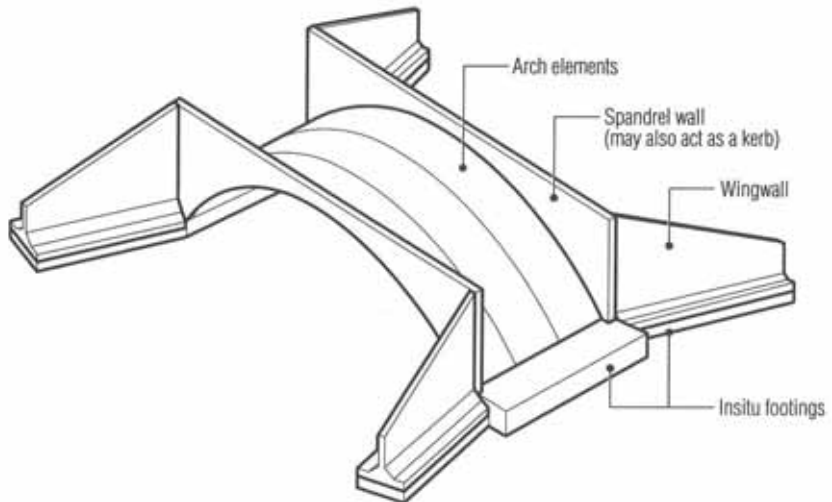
GENERAL ARRANGEMENT OF 9- AND 12-m-SPAN ARCHES WITH SPANDREL UNIT.
